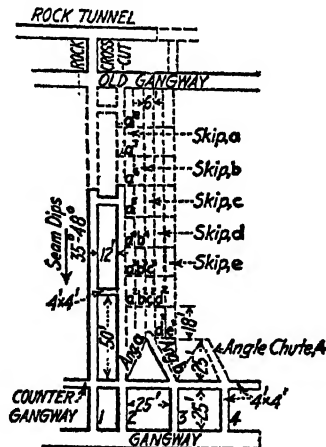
METHOD OF OPENING A FACE, MILLER MINE.
